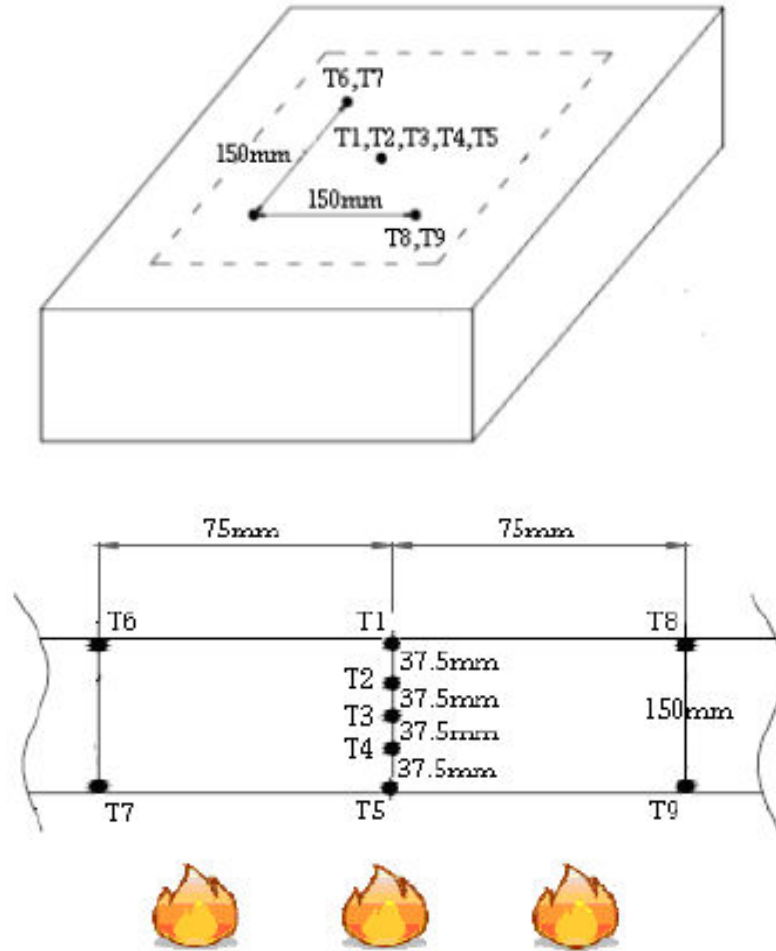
Thermocouple layout on LFC specimens on plan and throughout thickness
